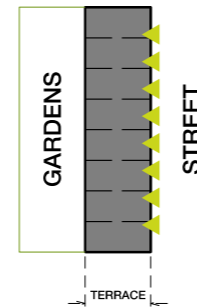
Plan diagram: Ground floor access - Standalone Terraced Houses.
